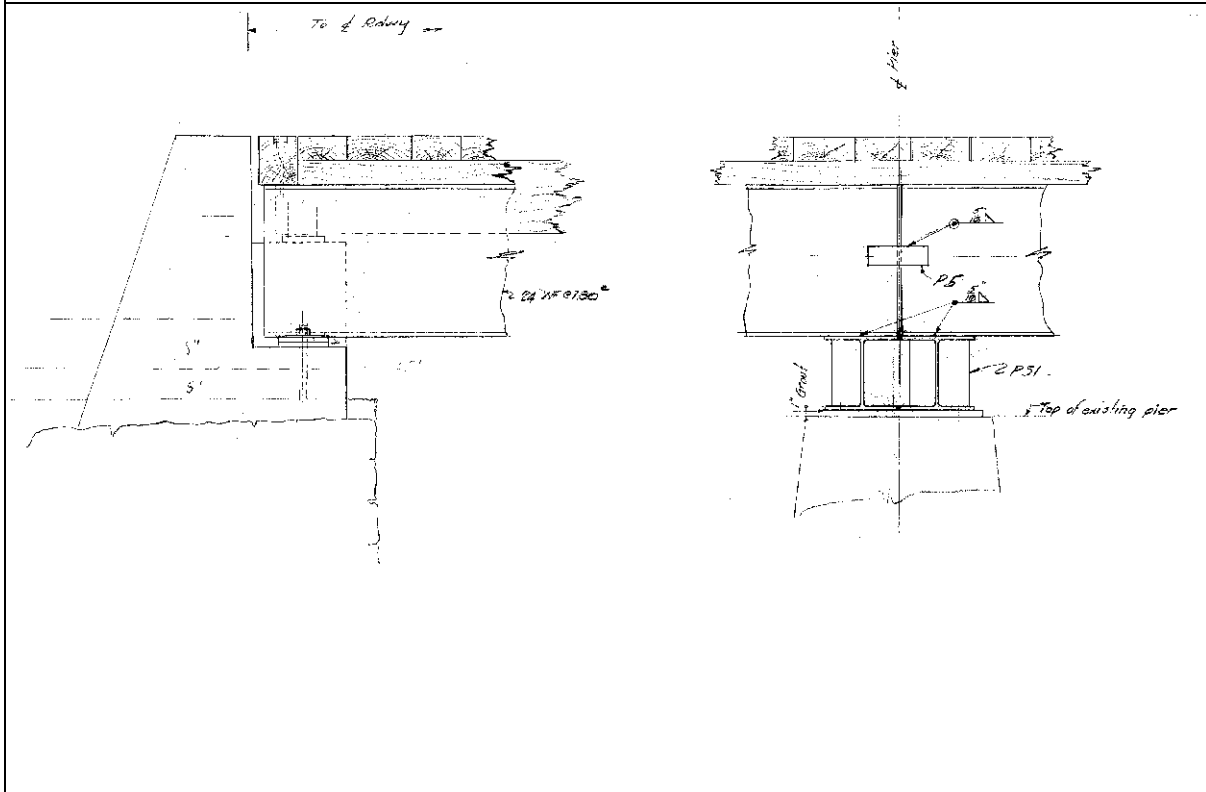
Plan of concrete seats and steel plate bearings added to stone abutments, and of steel pedestal bearings added to pier in 1954 rehab (from NHDPW Plan No. 3-4-1-14, dated 1/22/54).
